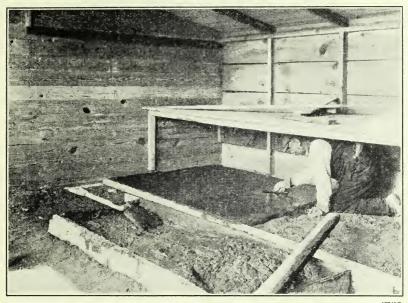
Rat proofing a poultry house by laying a concrete floor
